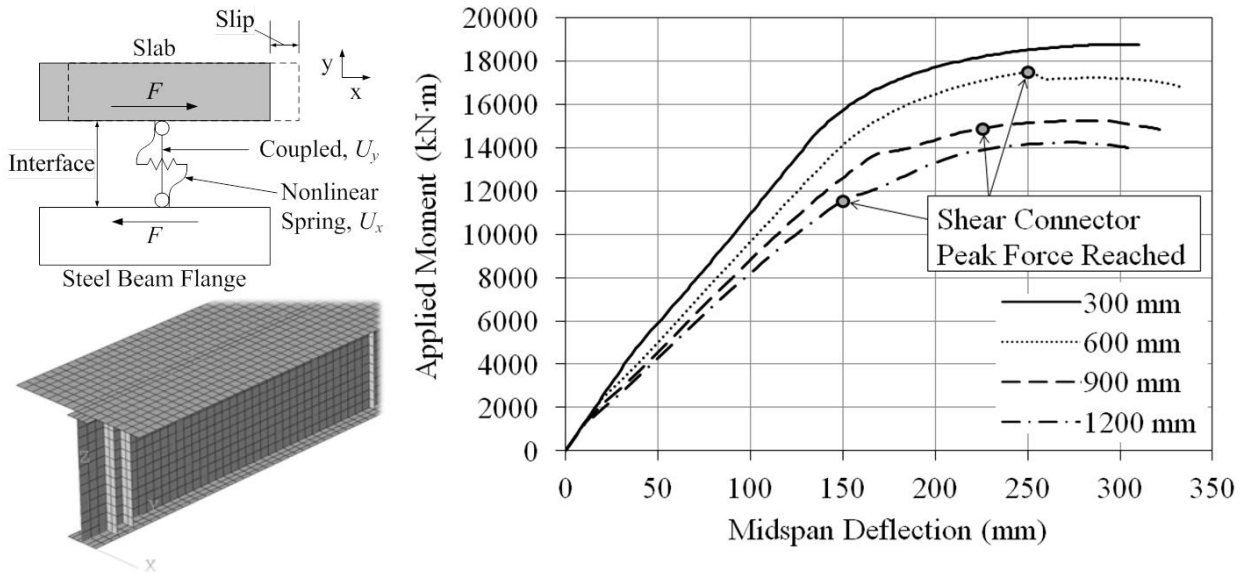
FE analysis of full-scale bridge girder with 2 x 16 mm through-bolts at various spacings.
